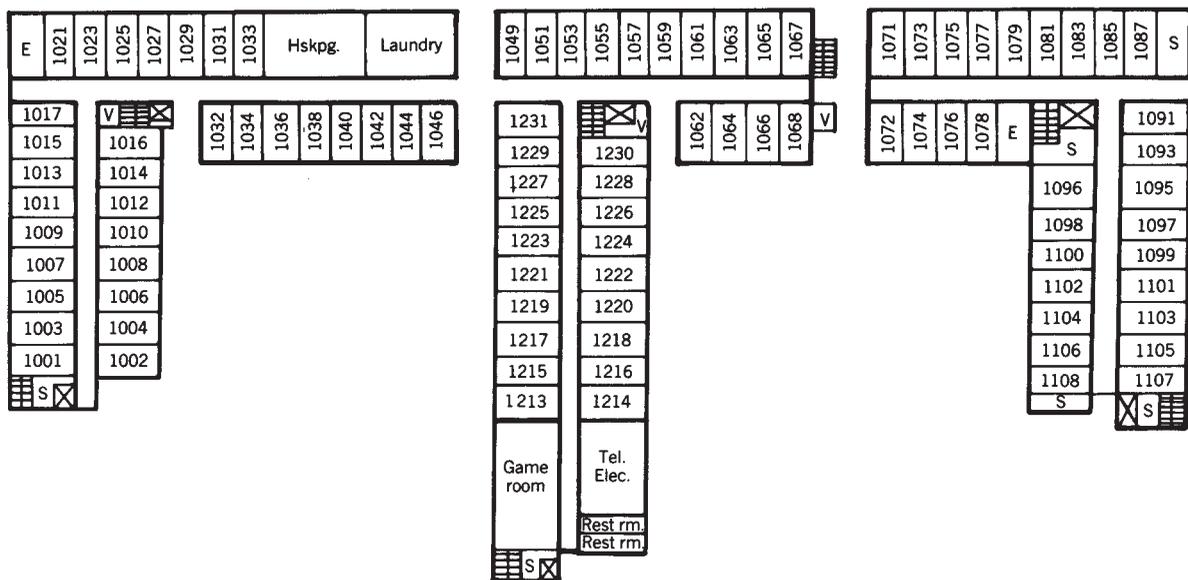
Floor plan layout of the model hotel; 94 first-floor rooms. Abbreviations for Figures 2.4–2.7: S, storage; V, vending; E, electrical switch room; X, elevator; GL, guest laundry.
